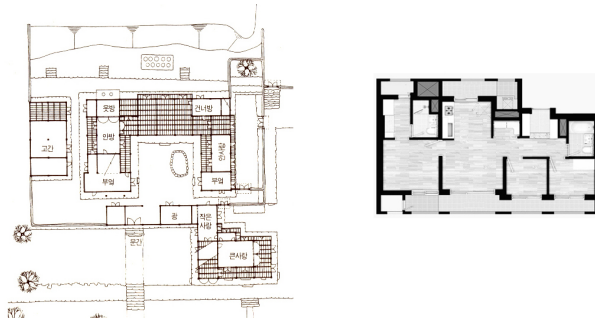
The Plan of Yun Jeung's House and a Typical Apartment House
